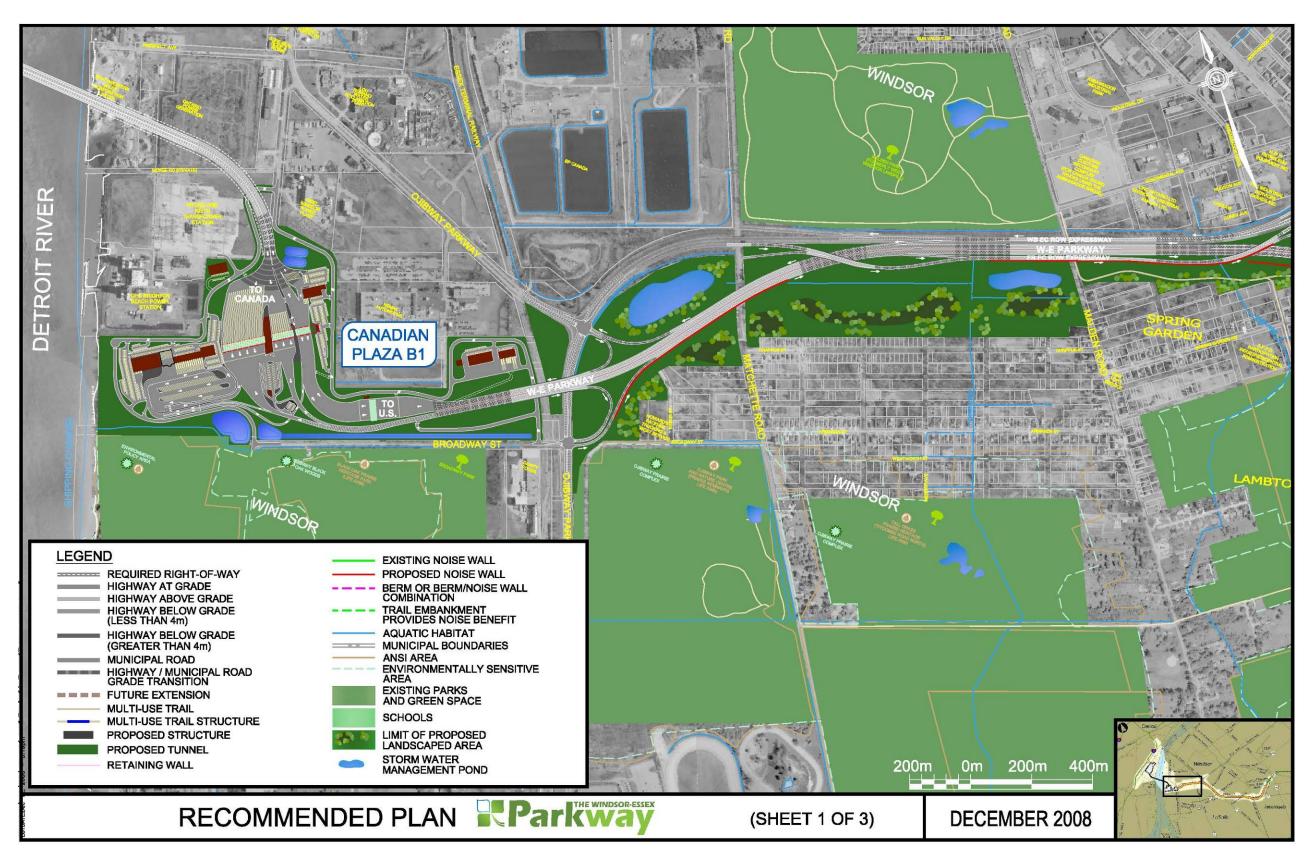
A. PROPOSED PLAN VIEW OF THE WINDSOR-ESSEX PARKWAY.
